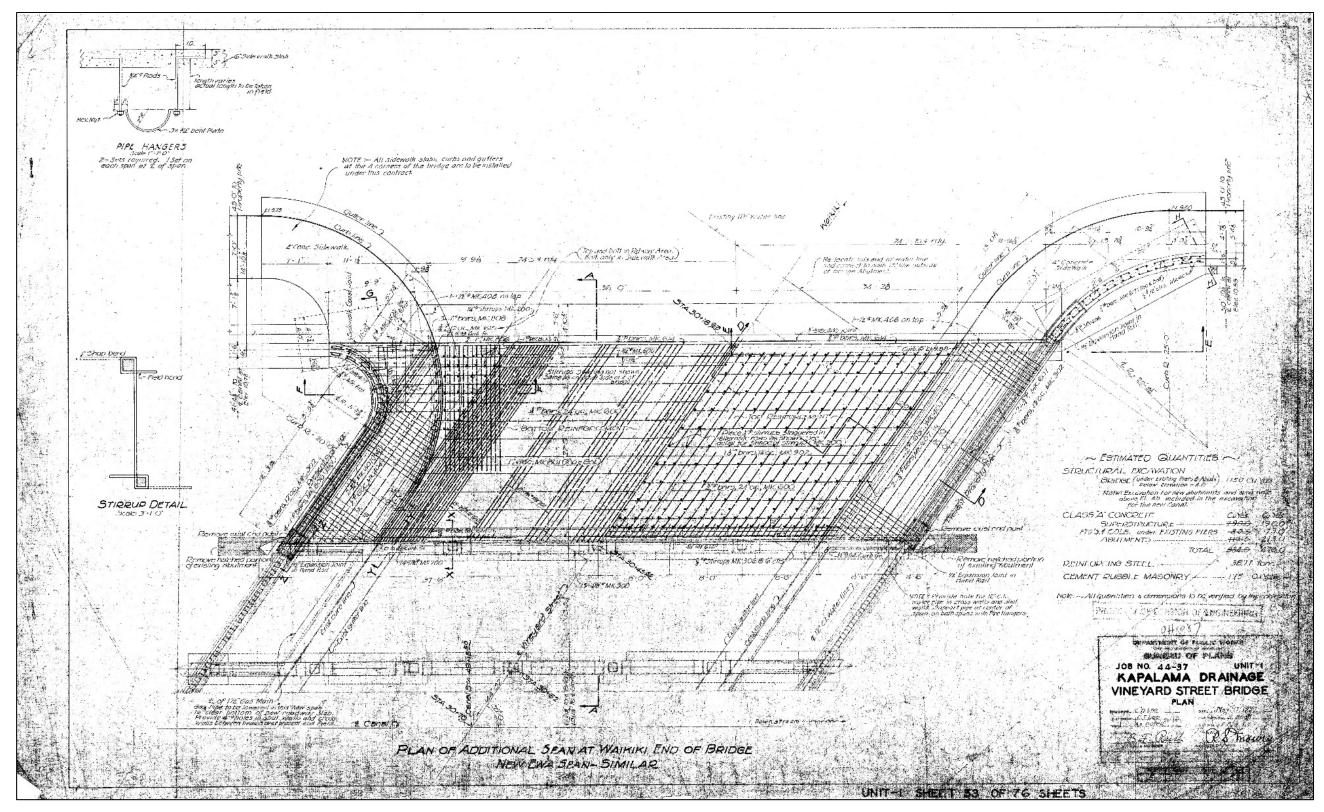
Department of Public Works plan for Kapālama Drainage Vineyard Street Bridge (Halona Street Bridge) dated 1937
